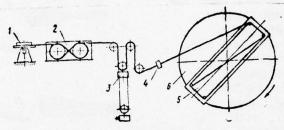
PRINCIPAL SCHEME FOR DN-5 TURNTABLE 1 - Rotor; 2 - Feed mechanism; 3 - Stressing mechanism; 4 - Pantograph; 5 - Cart; 6 - Rotating platform.
